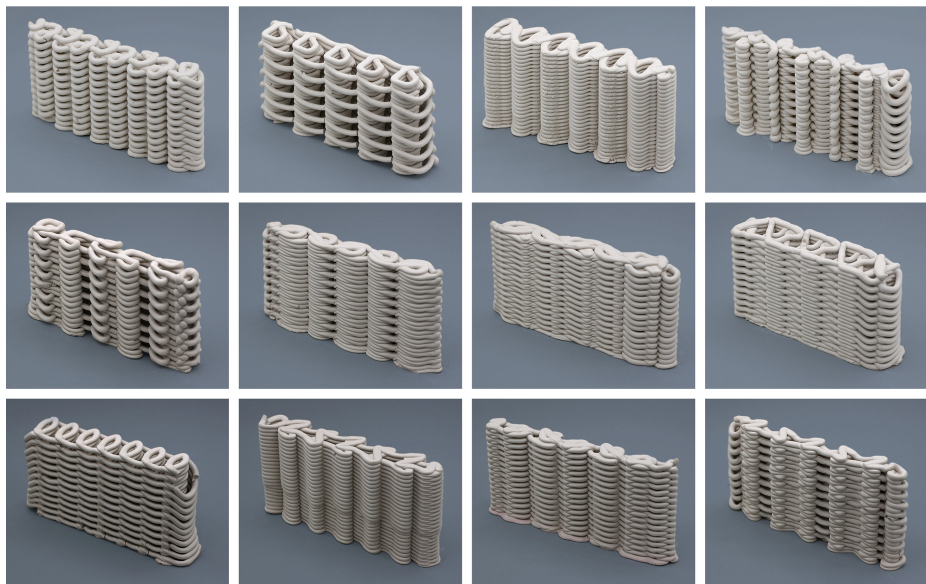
Selection of patterns. Prototypes fabricated in clay with Delta WASP 3MT printer with a 6 mm nozzle.
